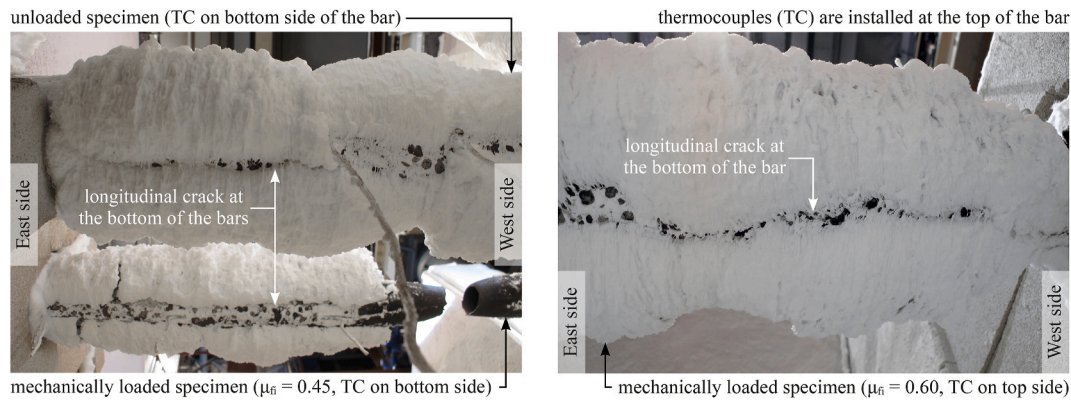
Bottom view of the mechanically loaded and unloaded tension members tested in horizontal orientation showing the longitudinal cracks (CHS D60; DFT = 2.5 mm).
